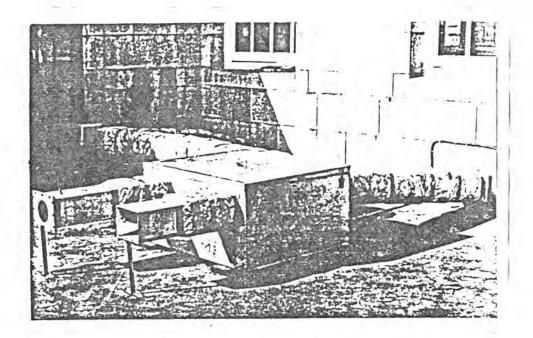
Heat Pump plant situated on the open roof outside the drawing office.
